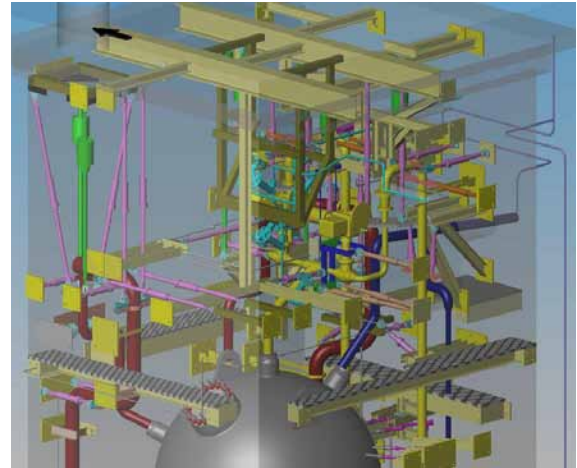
3-D modelling of piping and structure of pressurizer.
